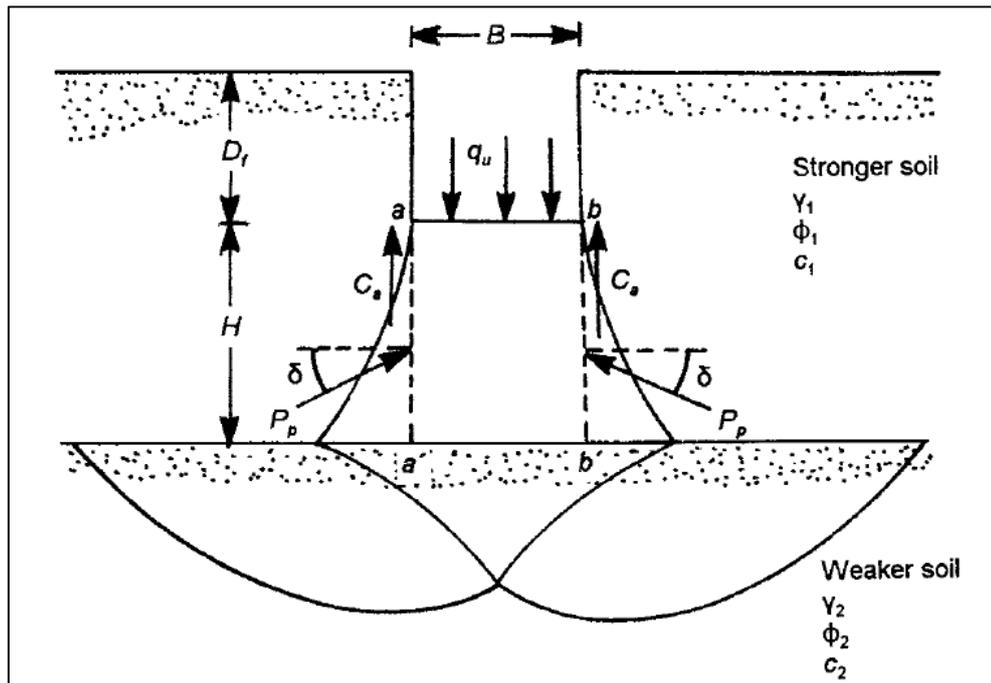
Rough continuous foundation on layered soil - stronger over weaker soil (Das, 1999).
